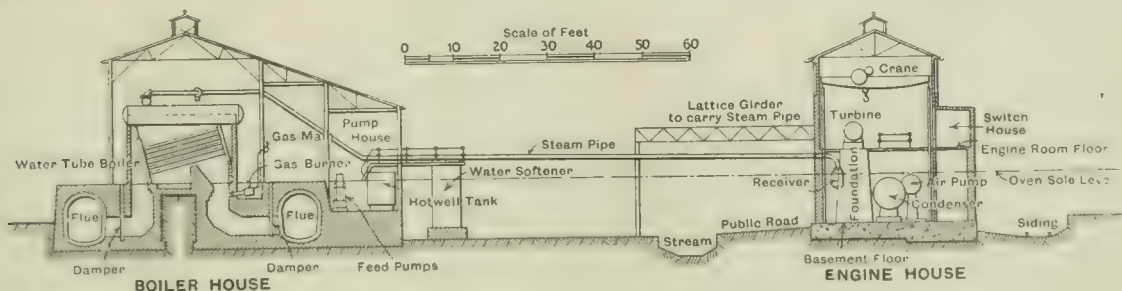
SECTIONAL ELEVATION OF BANKFOOT WASTE HEAT STATION.
